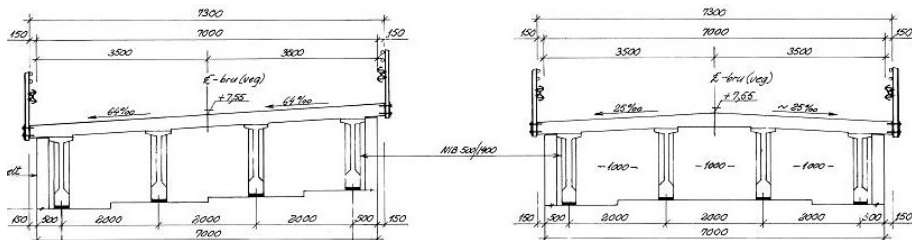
Section showing beams and deck in The Hulvågen Bridge
